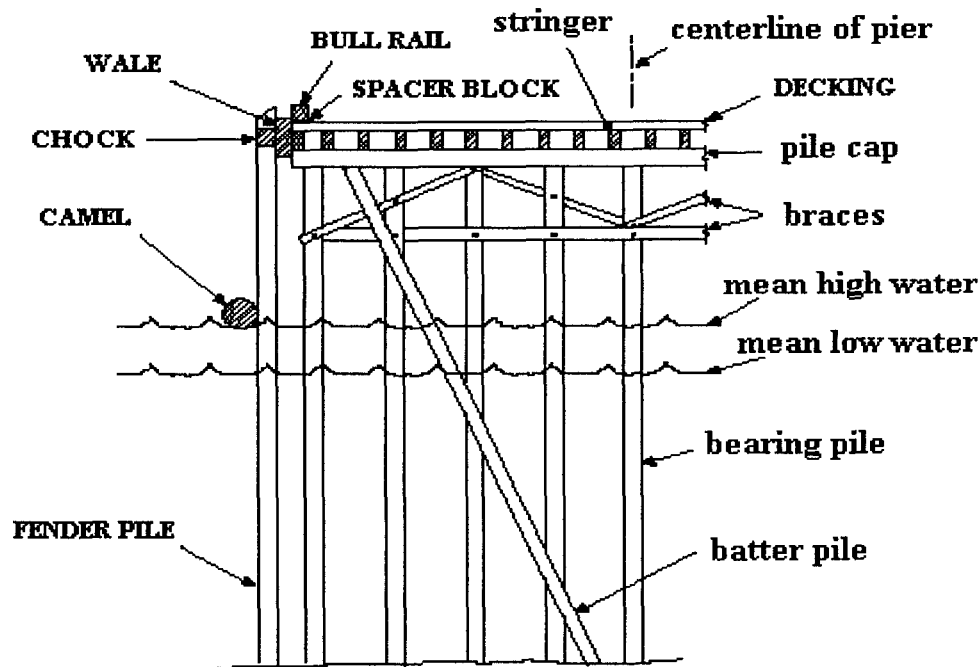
Typical pier cross section. (Source: Malvar et al. 1998)
